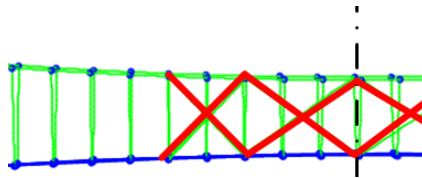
Vertical Bracing Pattern at Center of 50 m Span Footbridge
